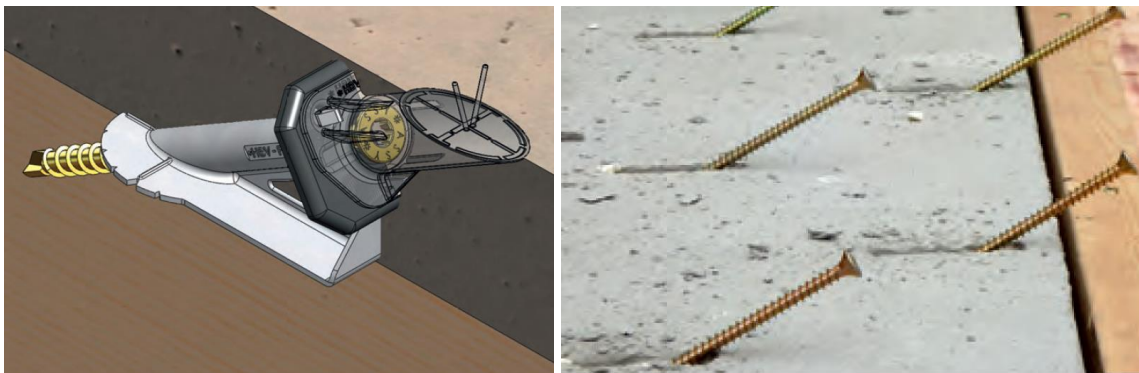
Wood-Concrete Composite Slab with Inclined Screws (Schraubenwerk Gaisbach GmbH)
